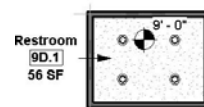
Module 9D: Front of House Restroom – Reflected Ceiling Plan
